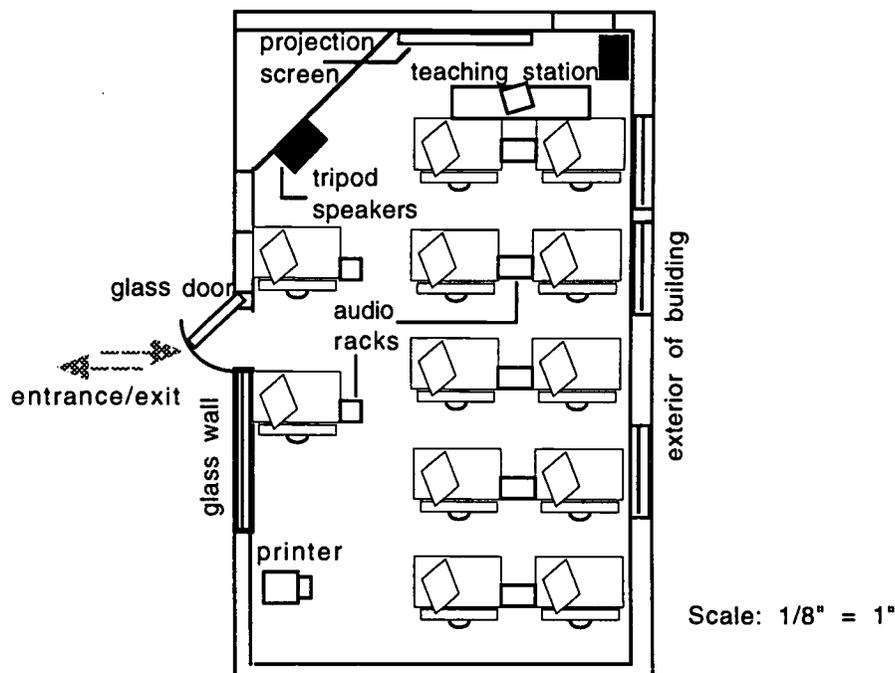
Floorplan and layout of the CTMI featuring 7 workstations and multimedia development station.
